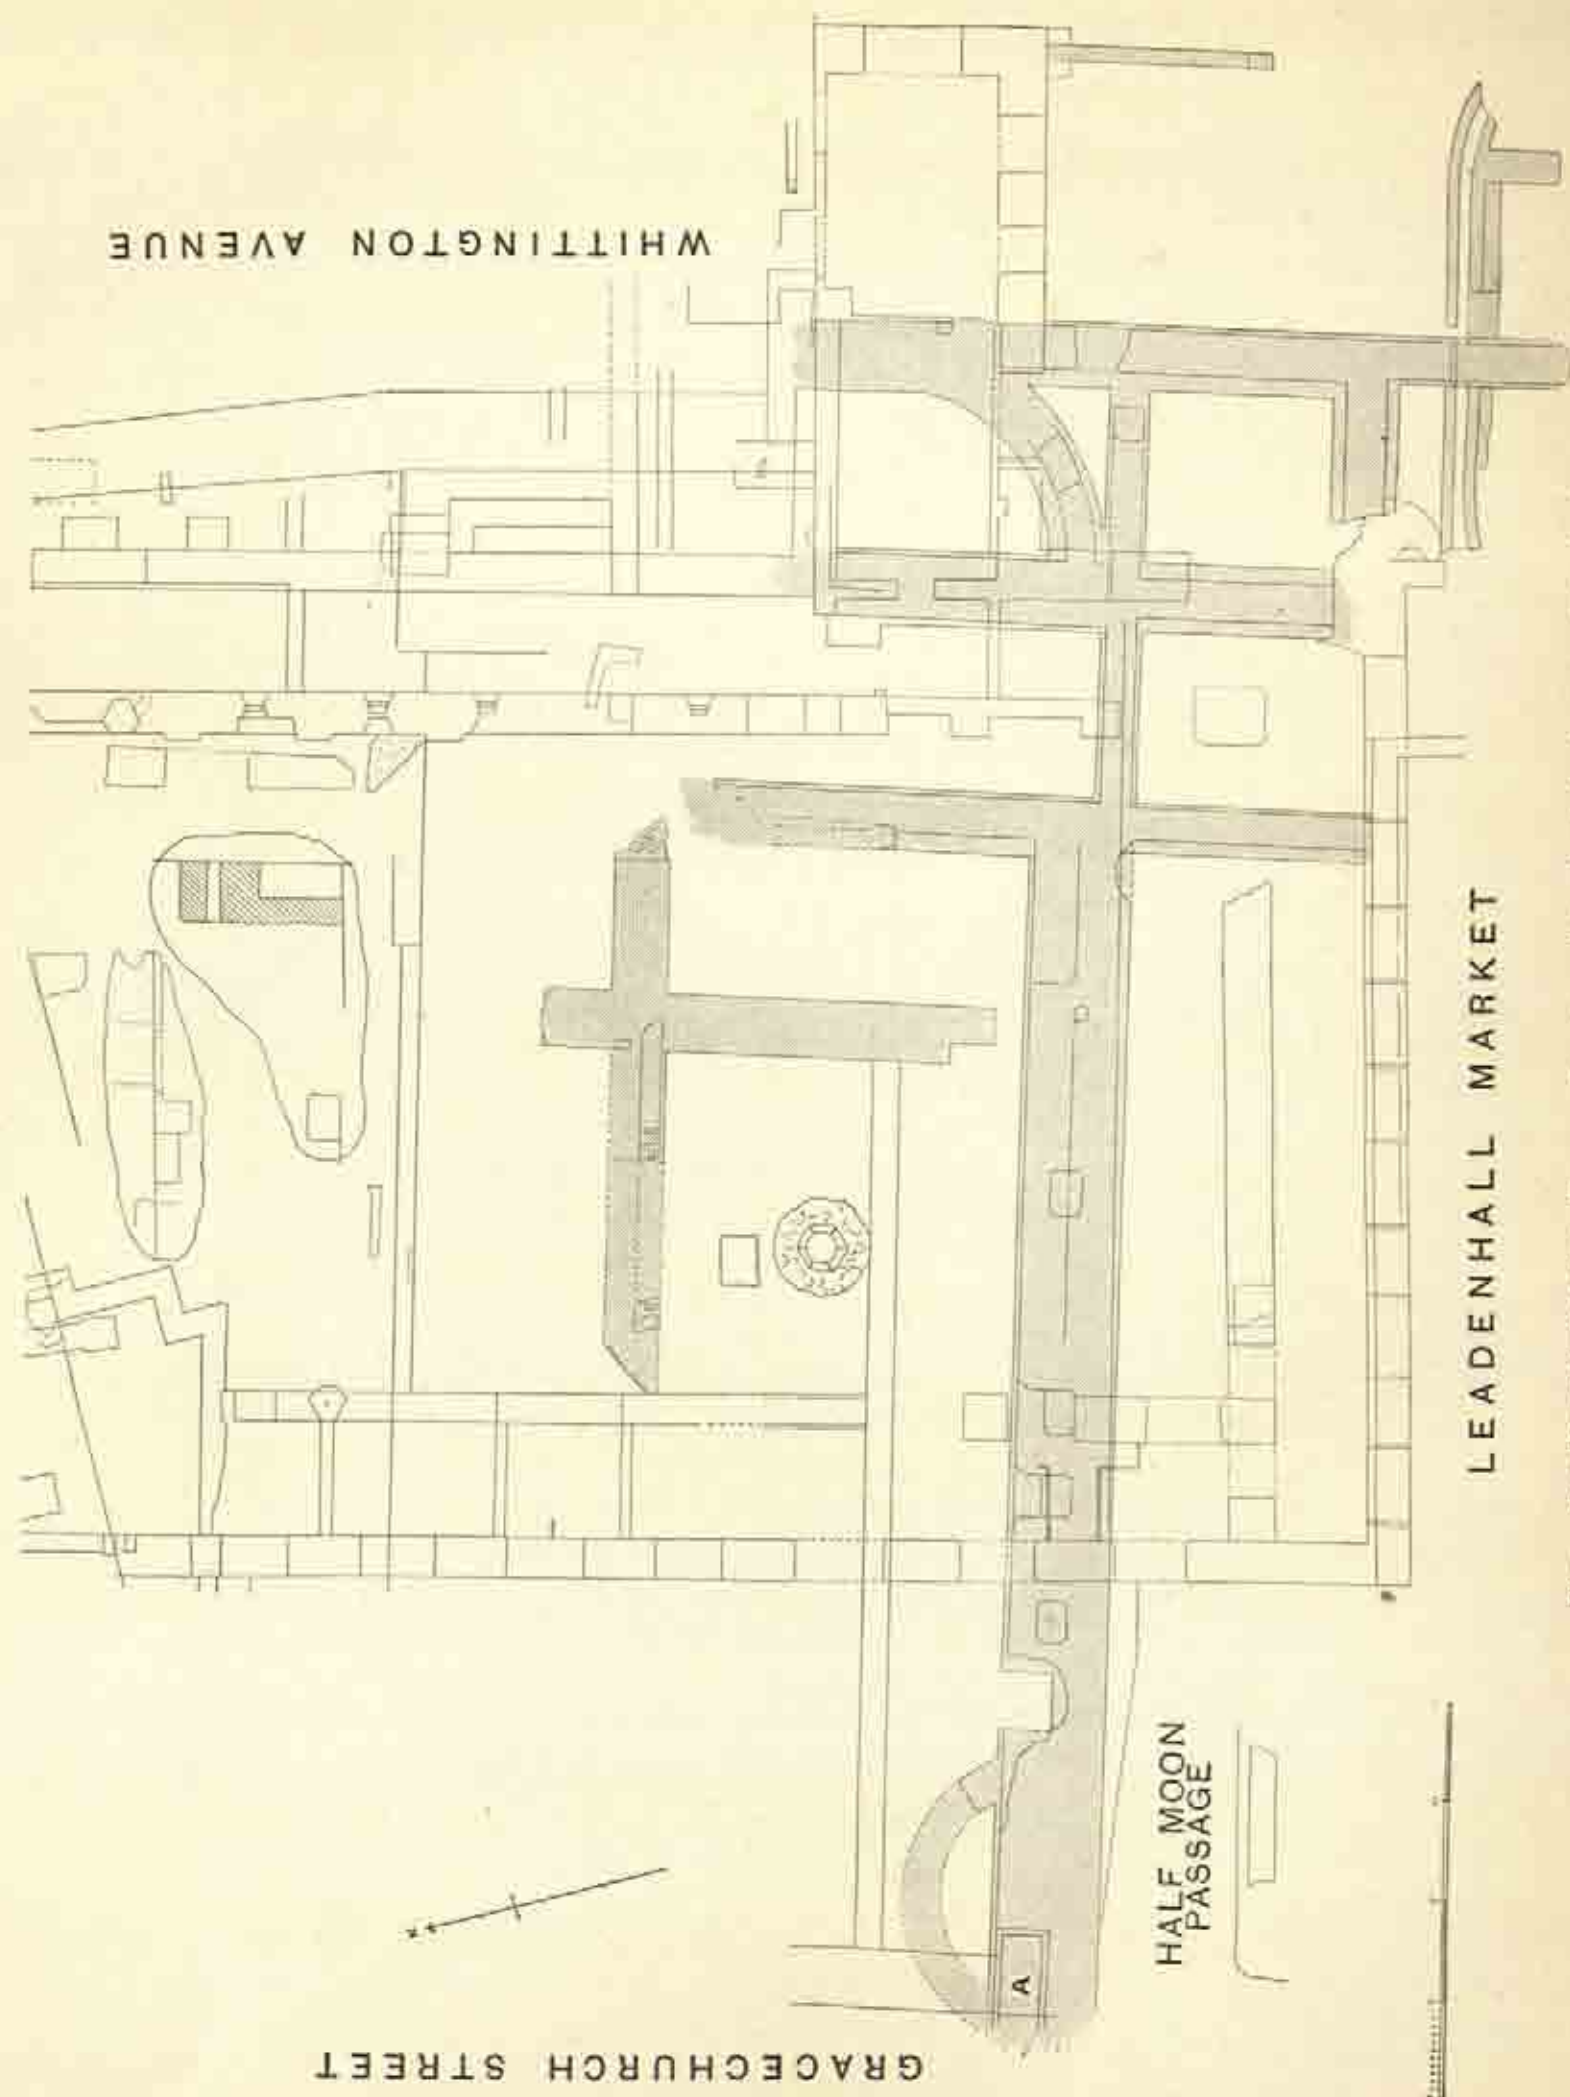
Site of Leadenhall Market. Roman walls and foundations hatched. A=extant brick pier, fig. 4.
